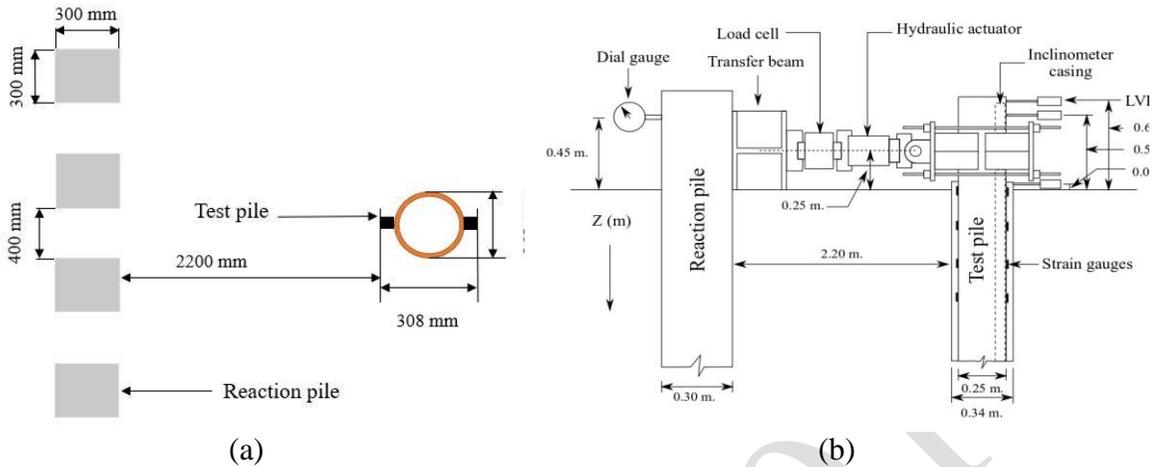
Arrangement of test pile and reaction piles (a) and schematic diagram of load providing assemblage (b).
